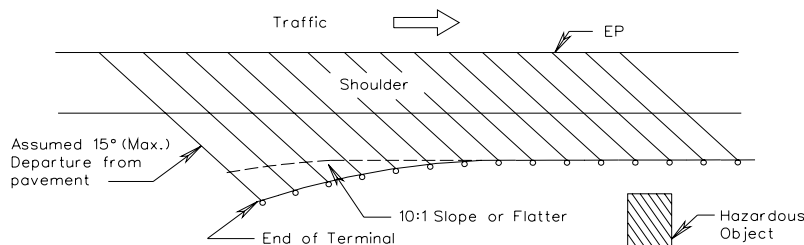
SUGGESTED SLOPES FOR APPROACH BARRIERS
